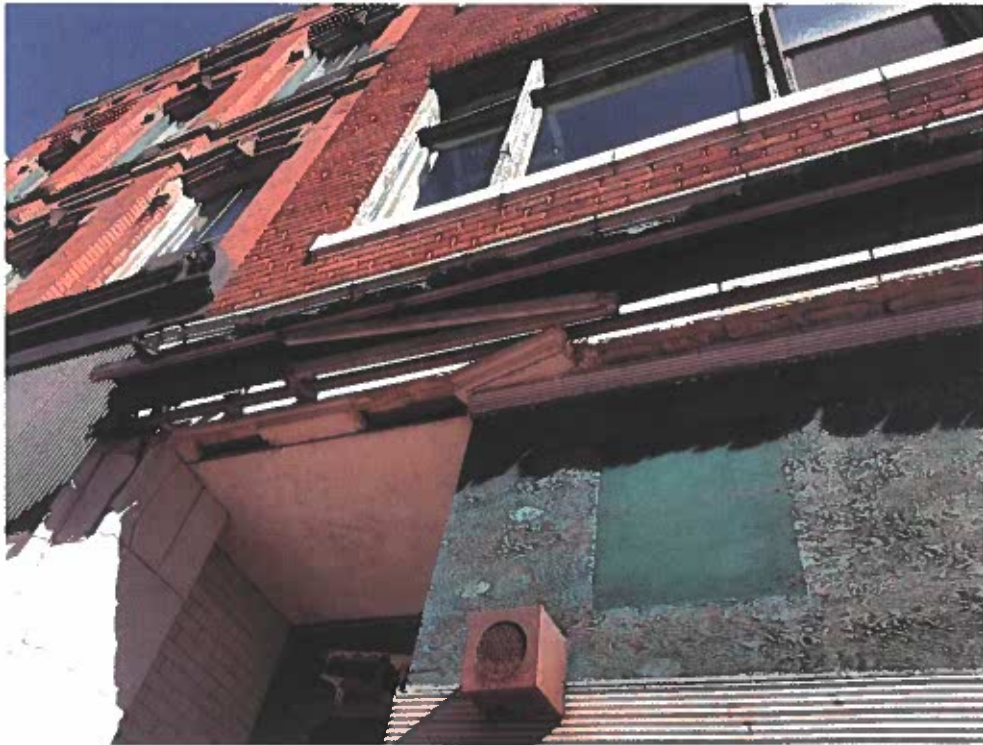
Masonry band is deteriorated and spalling off the building.
